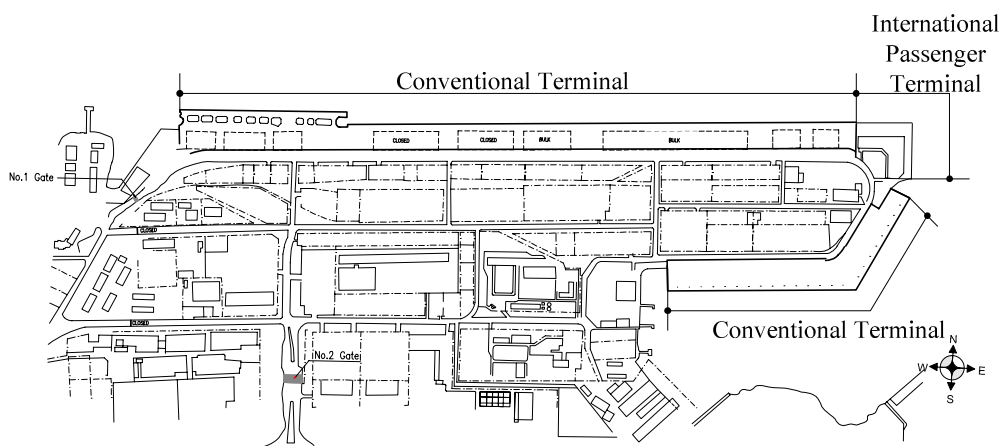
Layout Plan of Conventional Terminal
